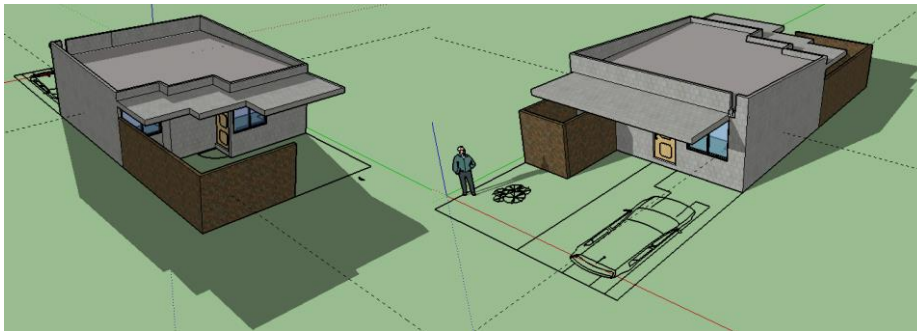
Invies house model with cantilever. South Facade. January. 14:00 h. Own work
